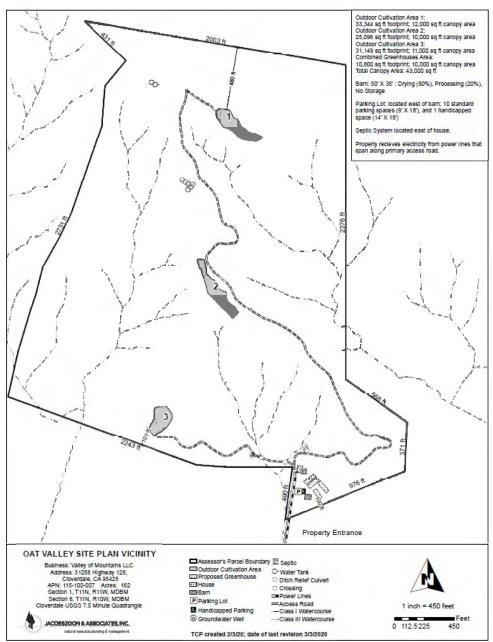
Overall Site Plan (Jacobzoon & Associates, 2020)
